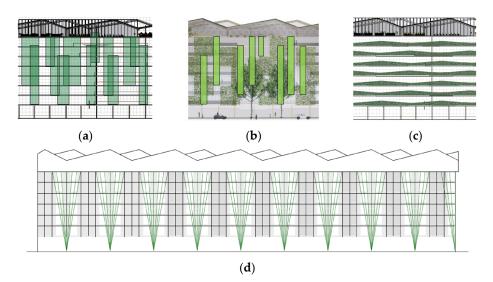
Development process of the 'Under the city roofs' façade design: (a) Façade concept 1: Superposition of green elements; (b) Façade concept 2: Vertically oriented façade greening; (c) Façade concept 2: Horizontally oriented façade greening; (d) Final façade concept.
